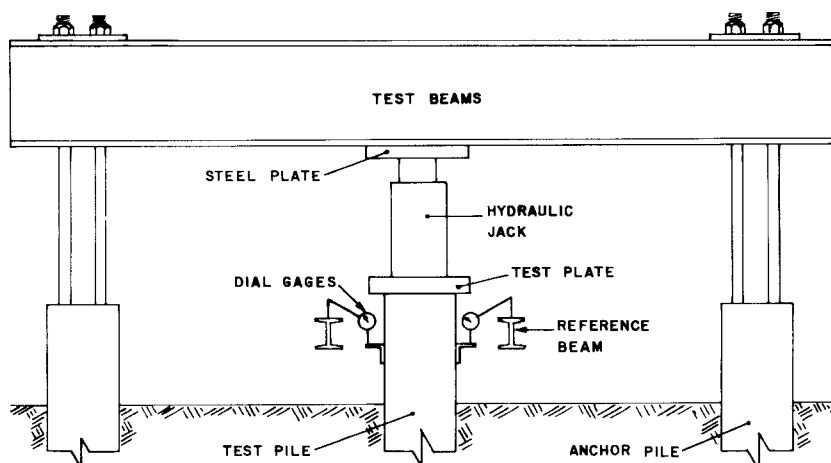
Schematic Setup for Applying Loads to Pile Using Hydraulic Jack Acting Against Anchored Reaction Frame
